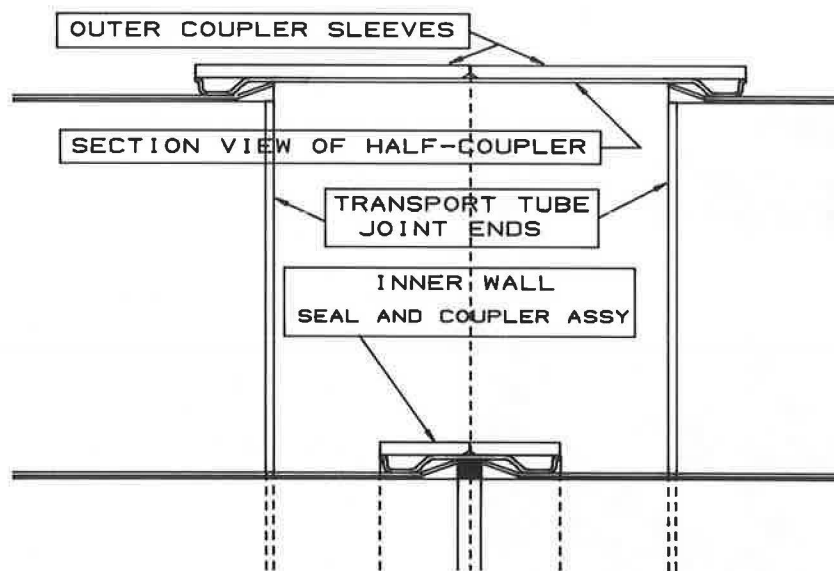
Side elevation section detail of composite coupler assemblies used to join composite tunnel structures.
